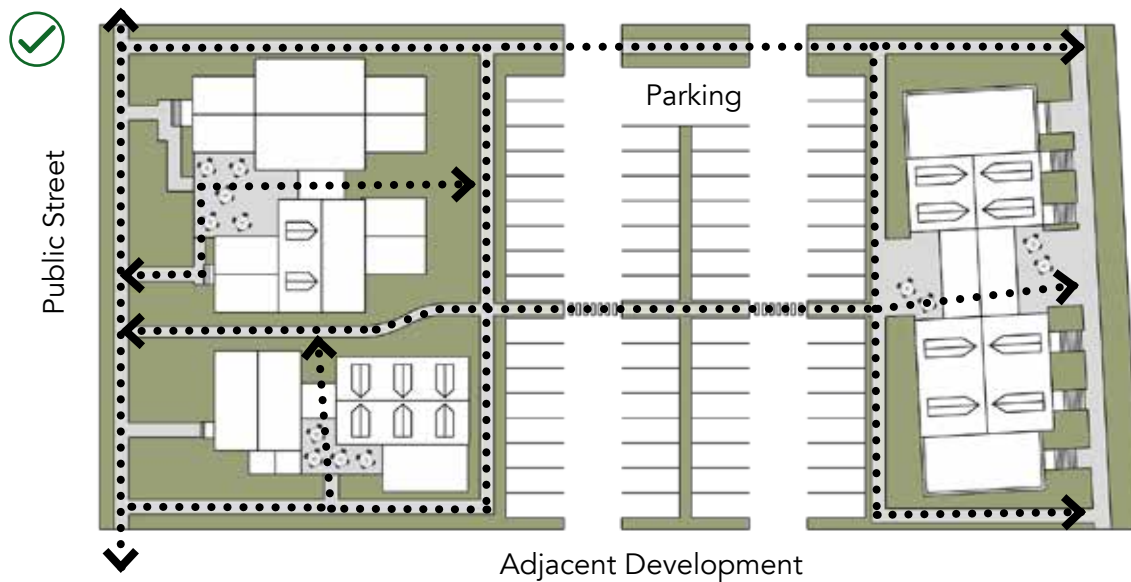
Incorporate bicycle parking into the design of a new building and in connection with existing bikeways.
